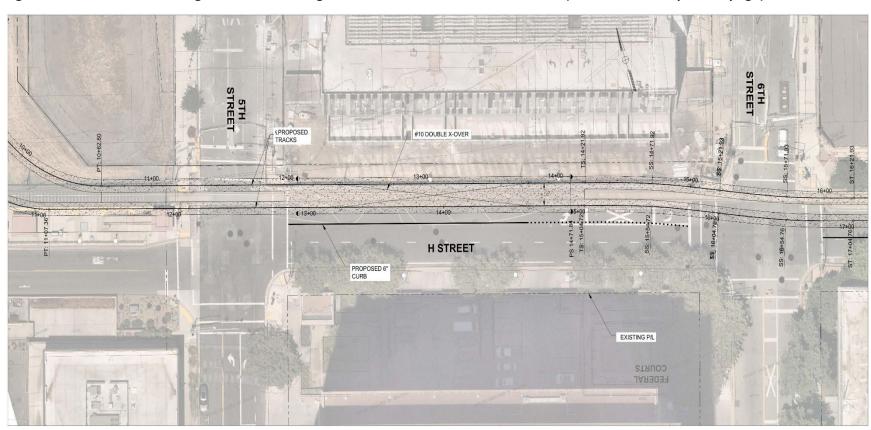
Plan View of SVS Light Rail Tracks along H Street between 5th and 6th Streets (north is to the top of the page)
